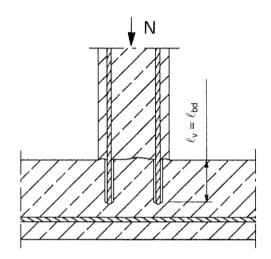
Overlapping joint at a foundation of a wall or column where the rebars are stressed in tension
